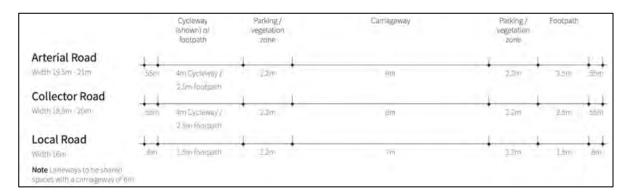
Proposed Road Cross-Sections (Source: Masterplan)
